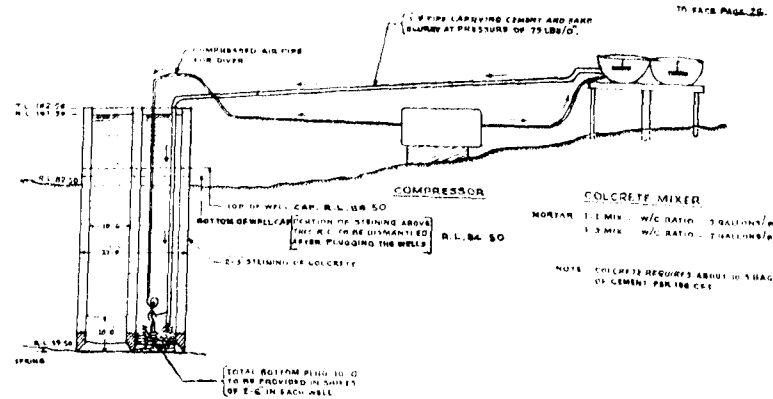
Plugging of wells in artesian spring at Budhara bridge, pier No. 3.
